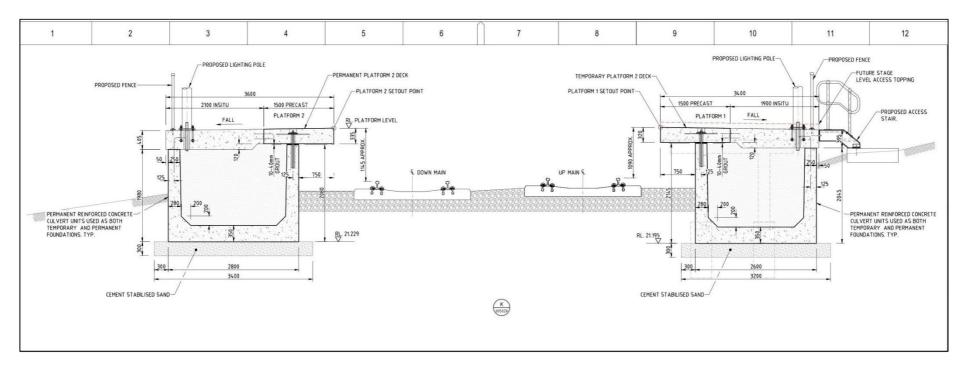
Section plan of the proposed Austinmer Station platform extensions (Source: Transport for Tomorrow 2025)
